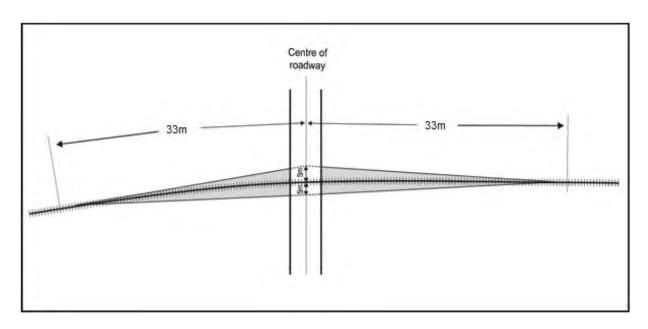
Restart sight triangles for public road/rail siding level crossings.
